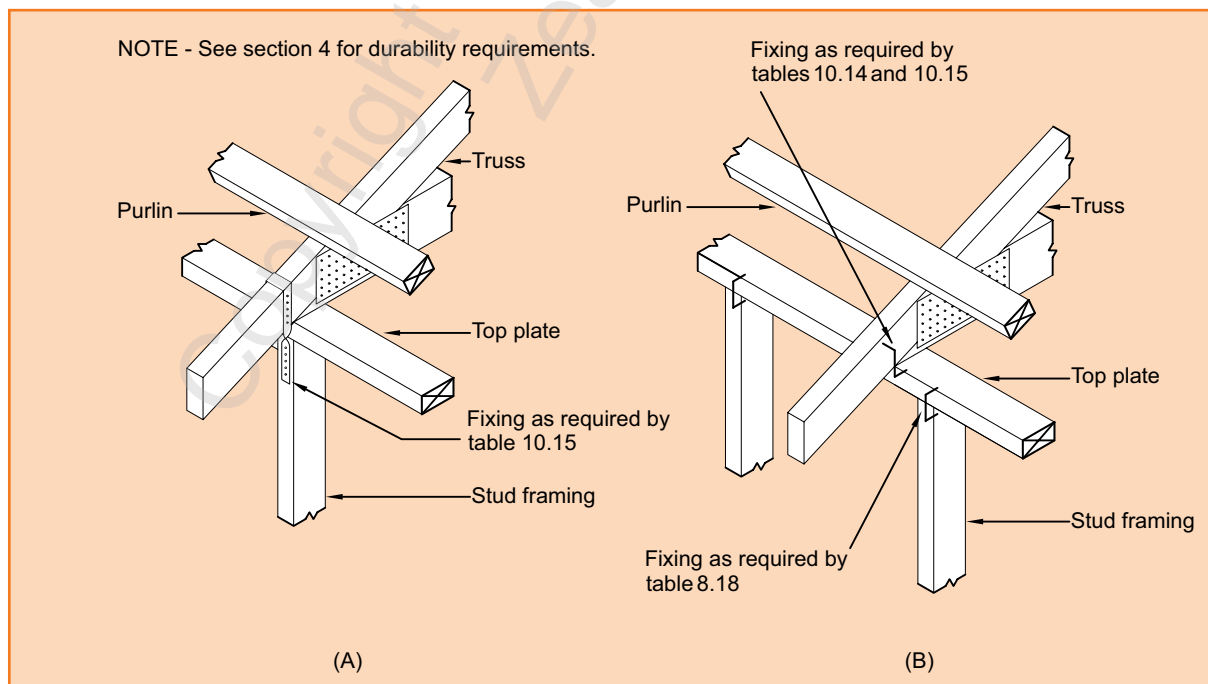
Truss/top plate connections (see 10.2.2.6)
